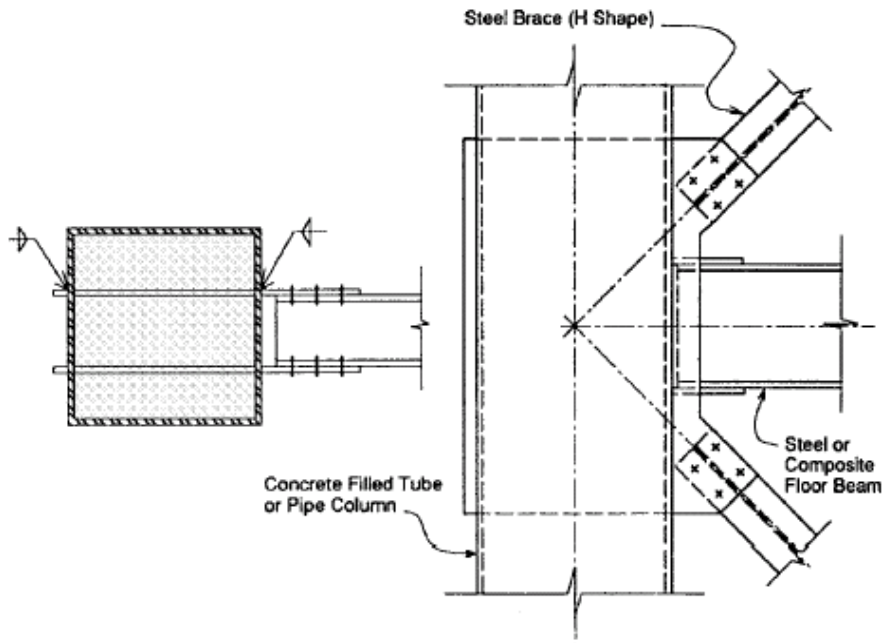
Concrete filled tube or pipe column-to-steel concentric base.
